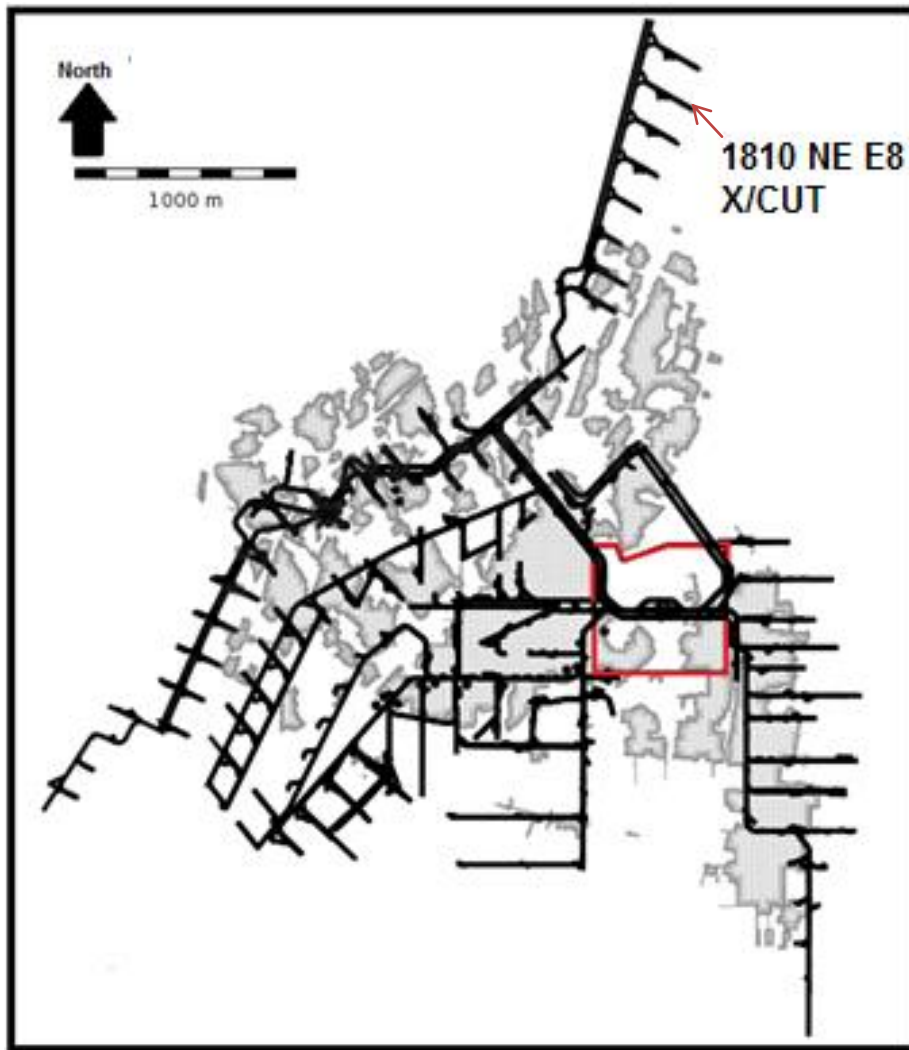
Masimong mine plan showing the layout of underground tunnels for mining level 1810 (actual depth = 2257 m). The mine shaft-pillar is shown in red and development (stopping) areas are grey hatched areas.
